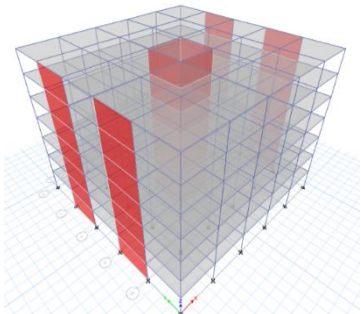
Model 10 - core shear wall at center with walls at periphery in one direction
